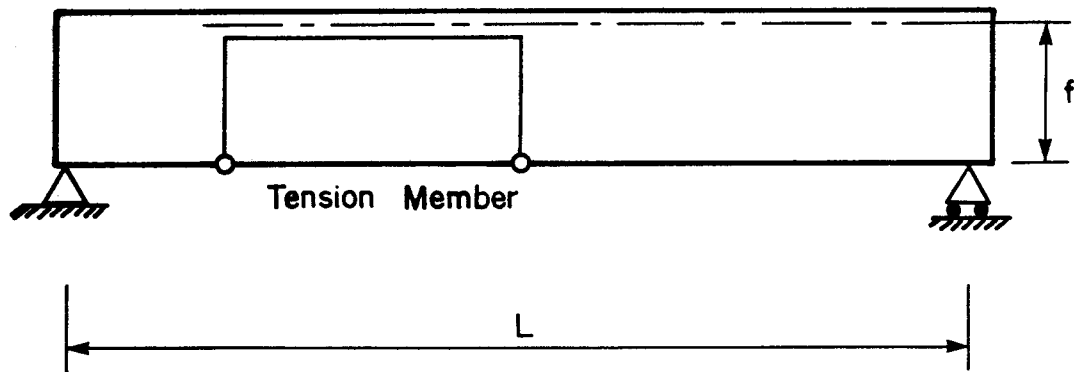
Lorentsen's Idealized Beam with Web Opening.
